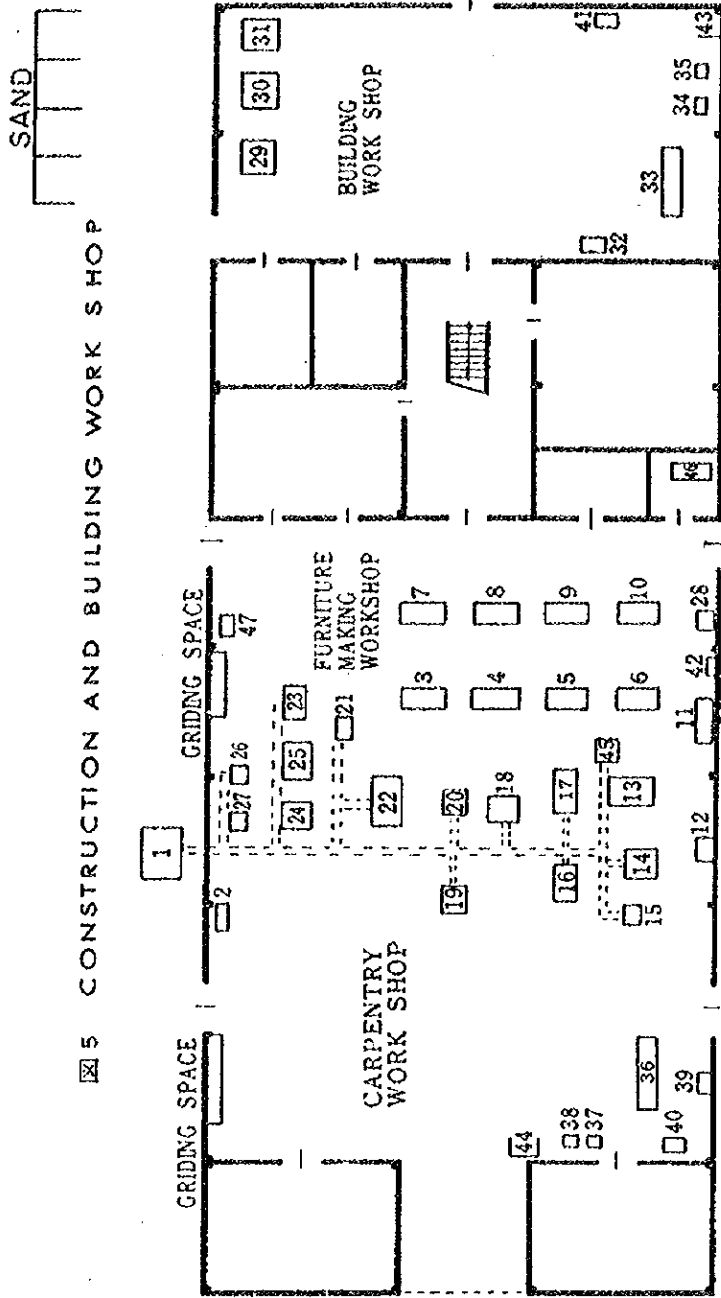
CONSTRUCTION AND BUILDING WORK SHOP
